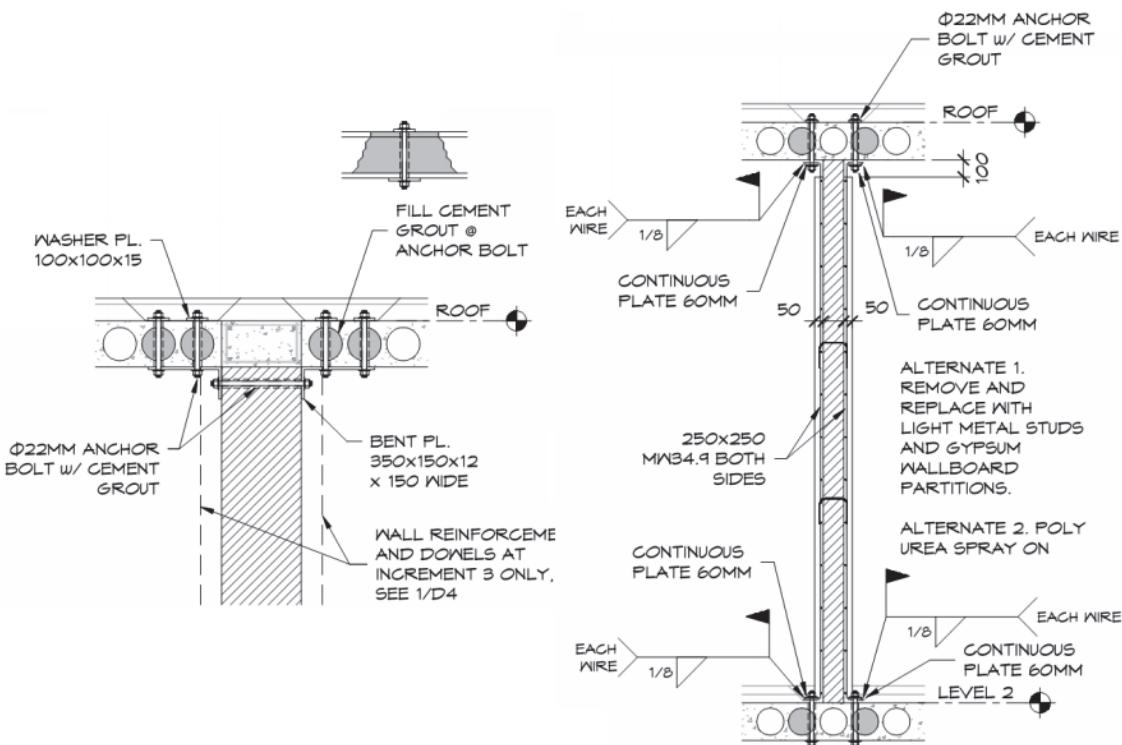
Details of CM Increment 1 showing bracing of nonstructural masonry walls.
